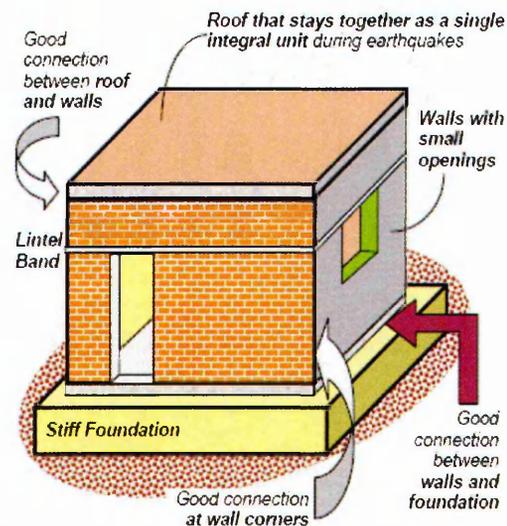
Essential requirements to ensure box action in a masonry building (IITK-BMTPC, 2003)
